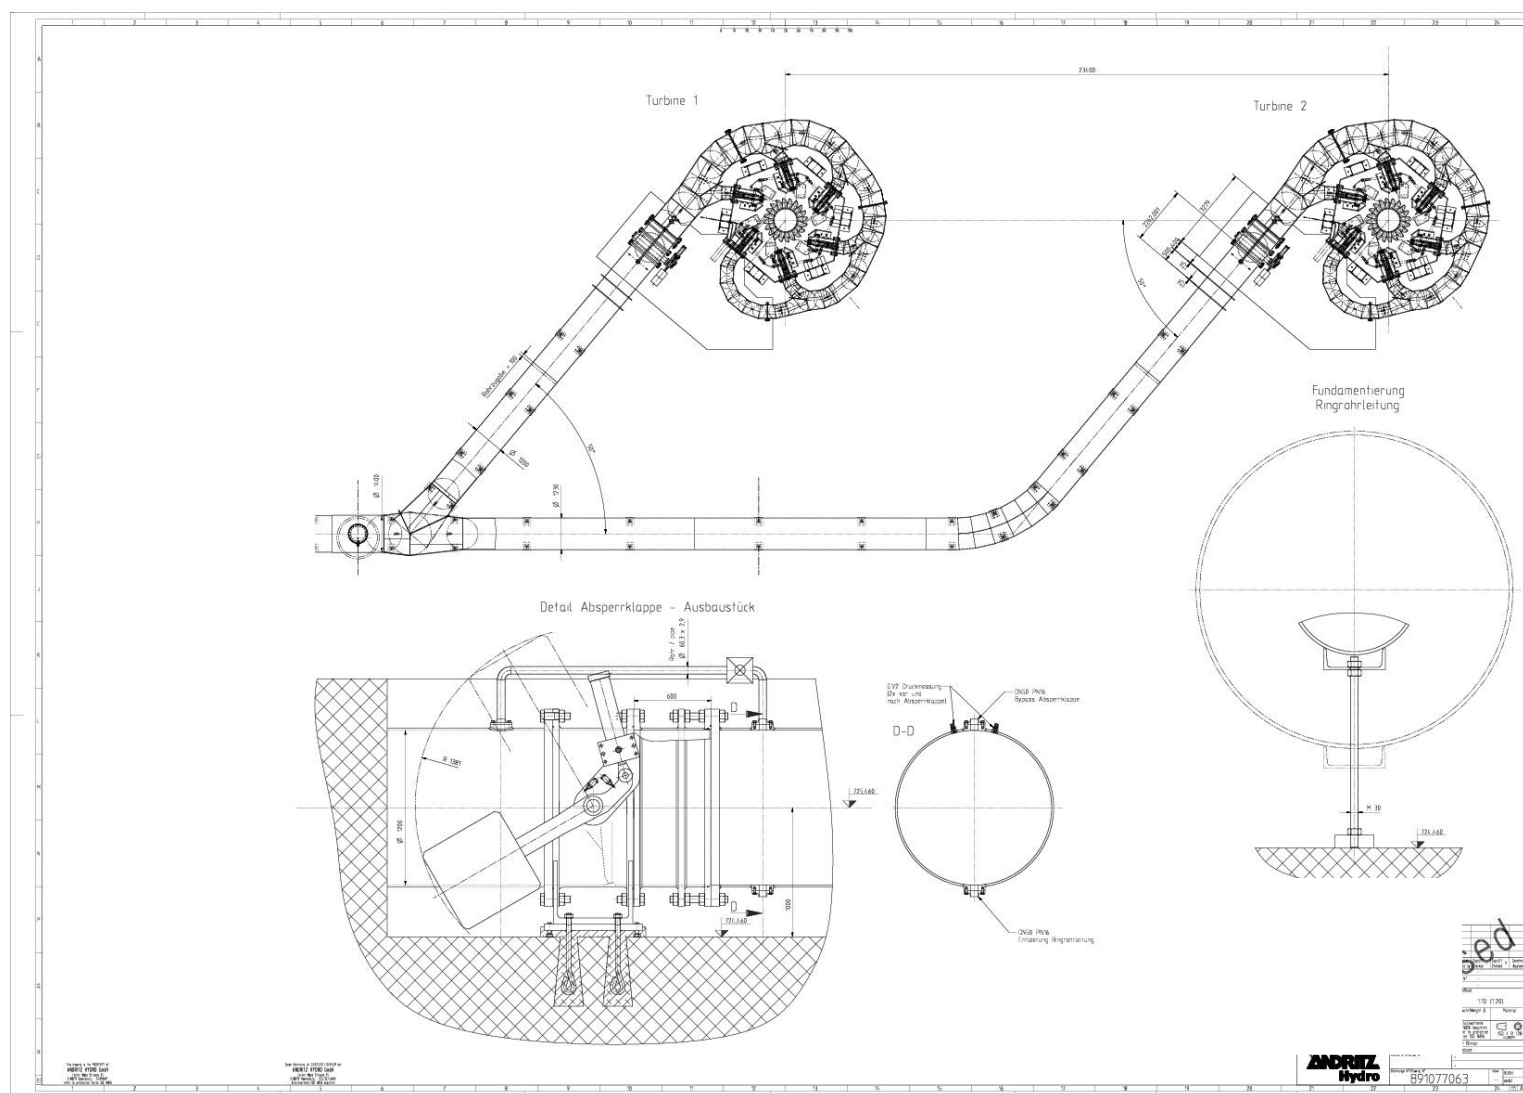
Typical Installation of Adjacent Turbines and Main Control Valve
